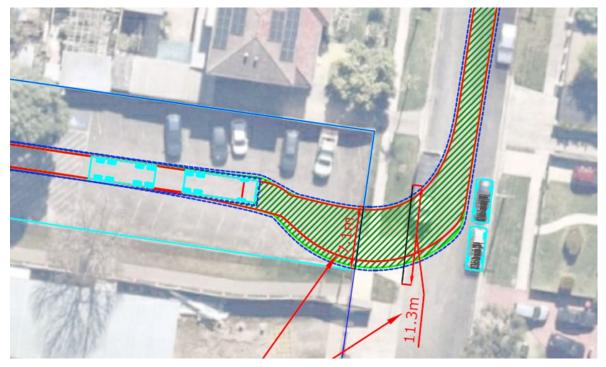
Construction Vehicle Site Access Point – Stage 2 - Milestone 1
